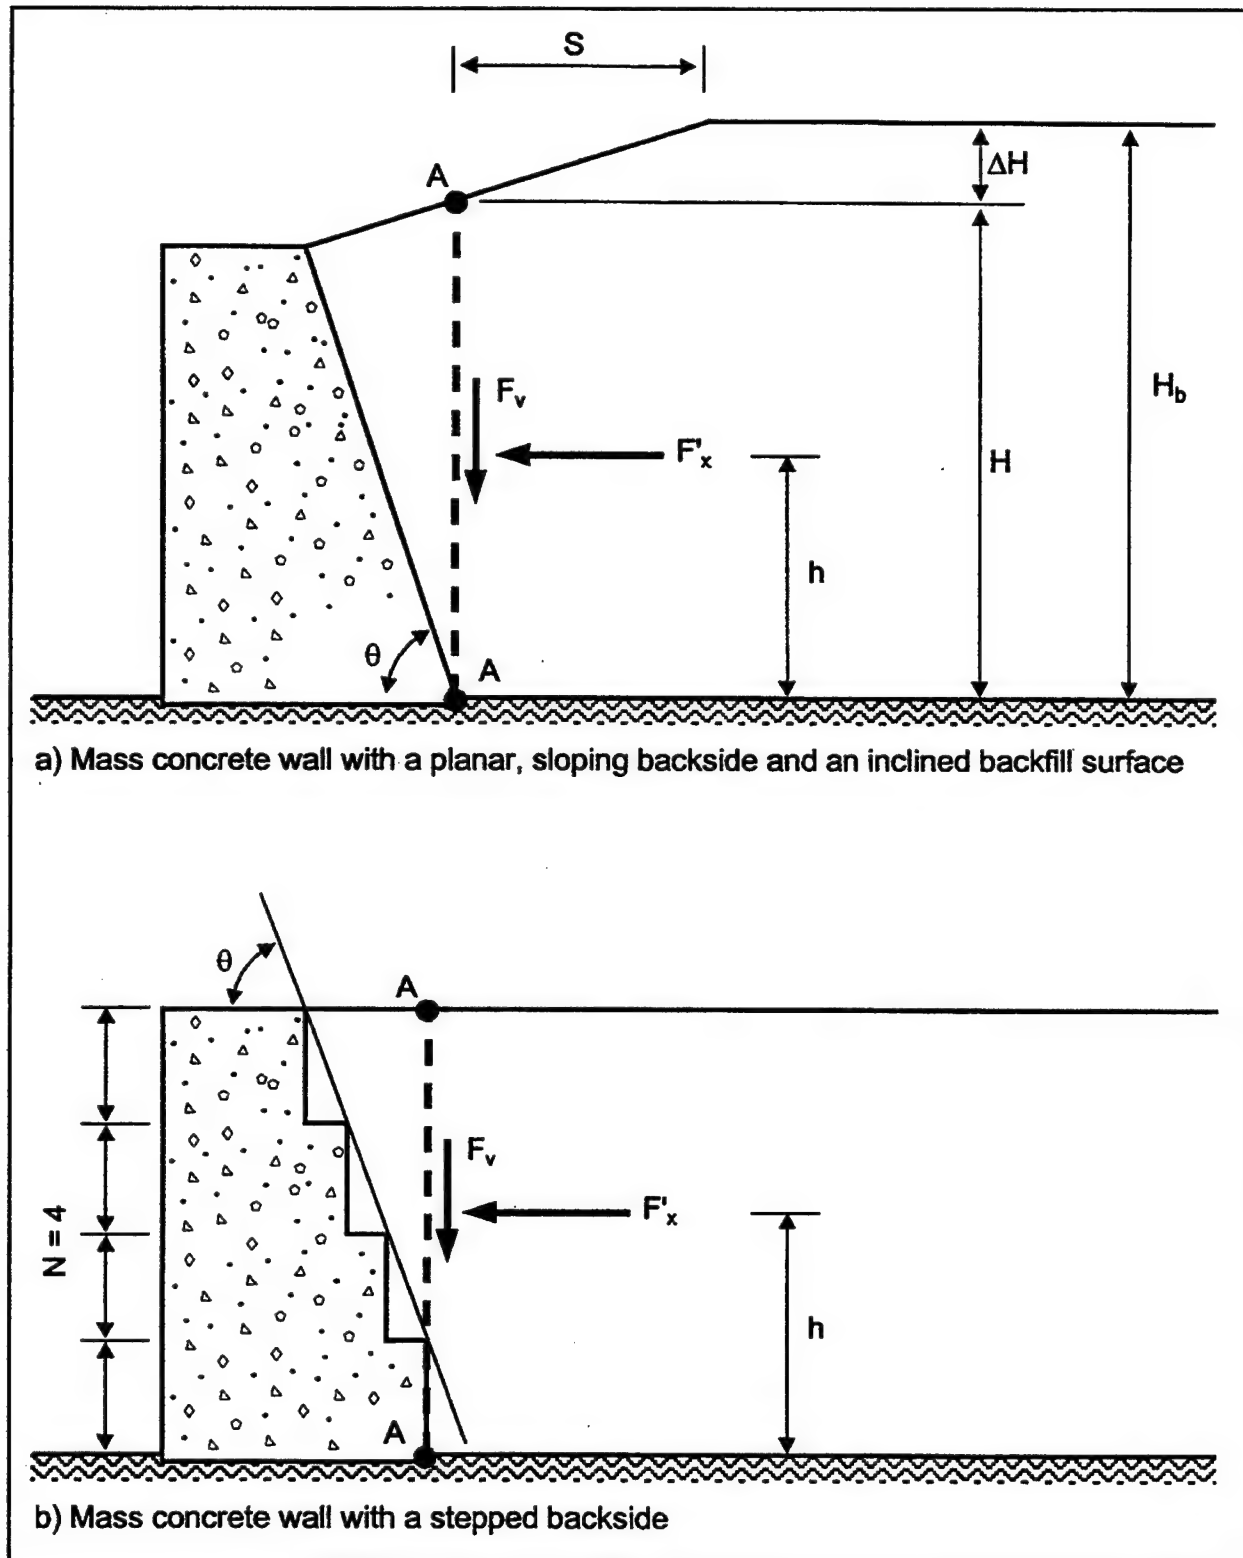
Rock-founded retaining wall definition sketches (adapted from Filz, Duncan, and Ebeling 1997)
